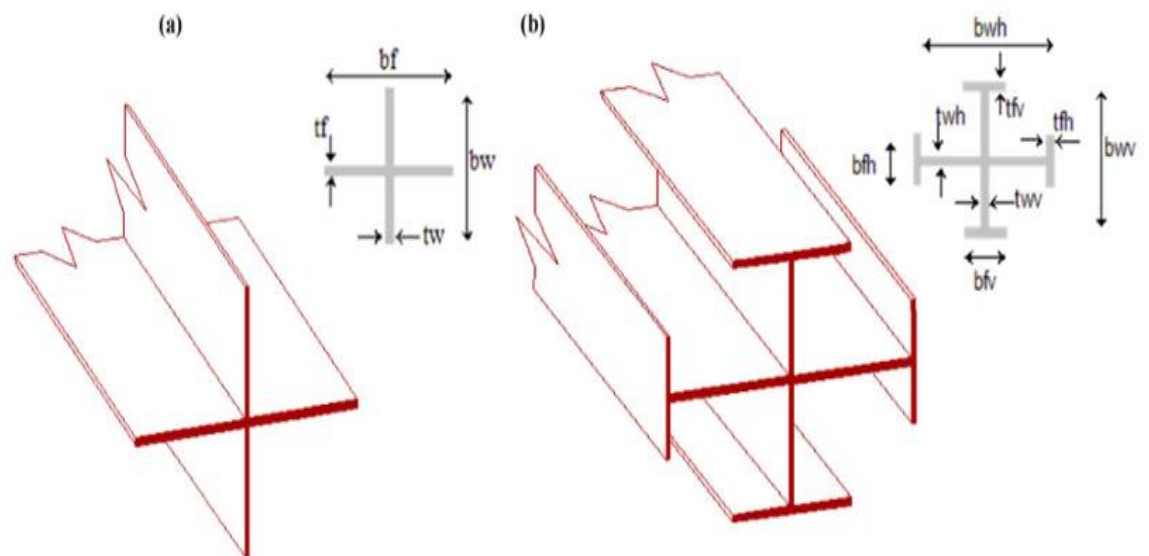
Steel Cruciform Section: (a) unstiffened, and (b) stiffened, [17]
